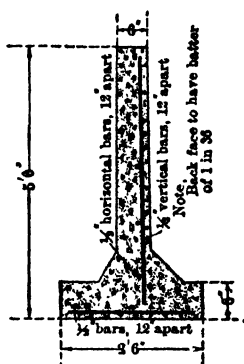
Reinforced-concrete Retaining-wall, 5 ft High
